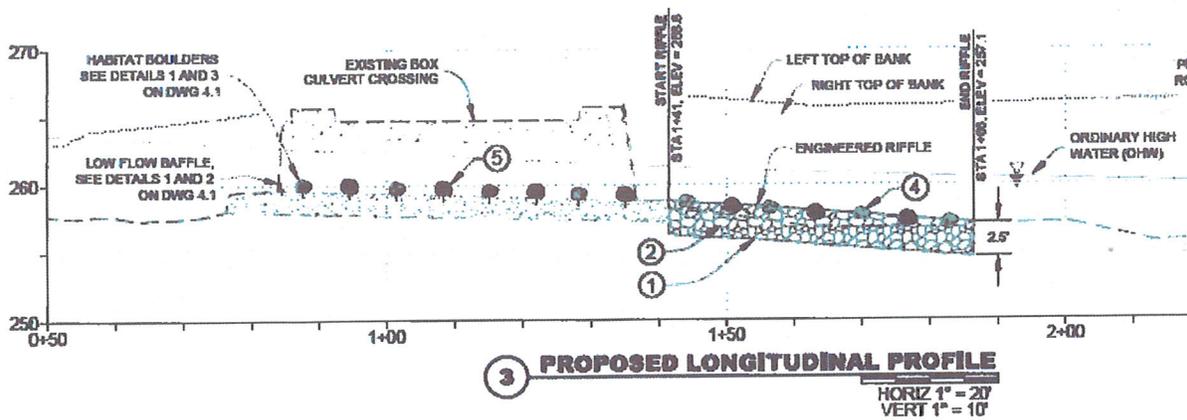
Profile of 29<sup>th</sup> Street box culverts and proposed fish passage retrofits.
